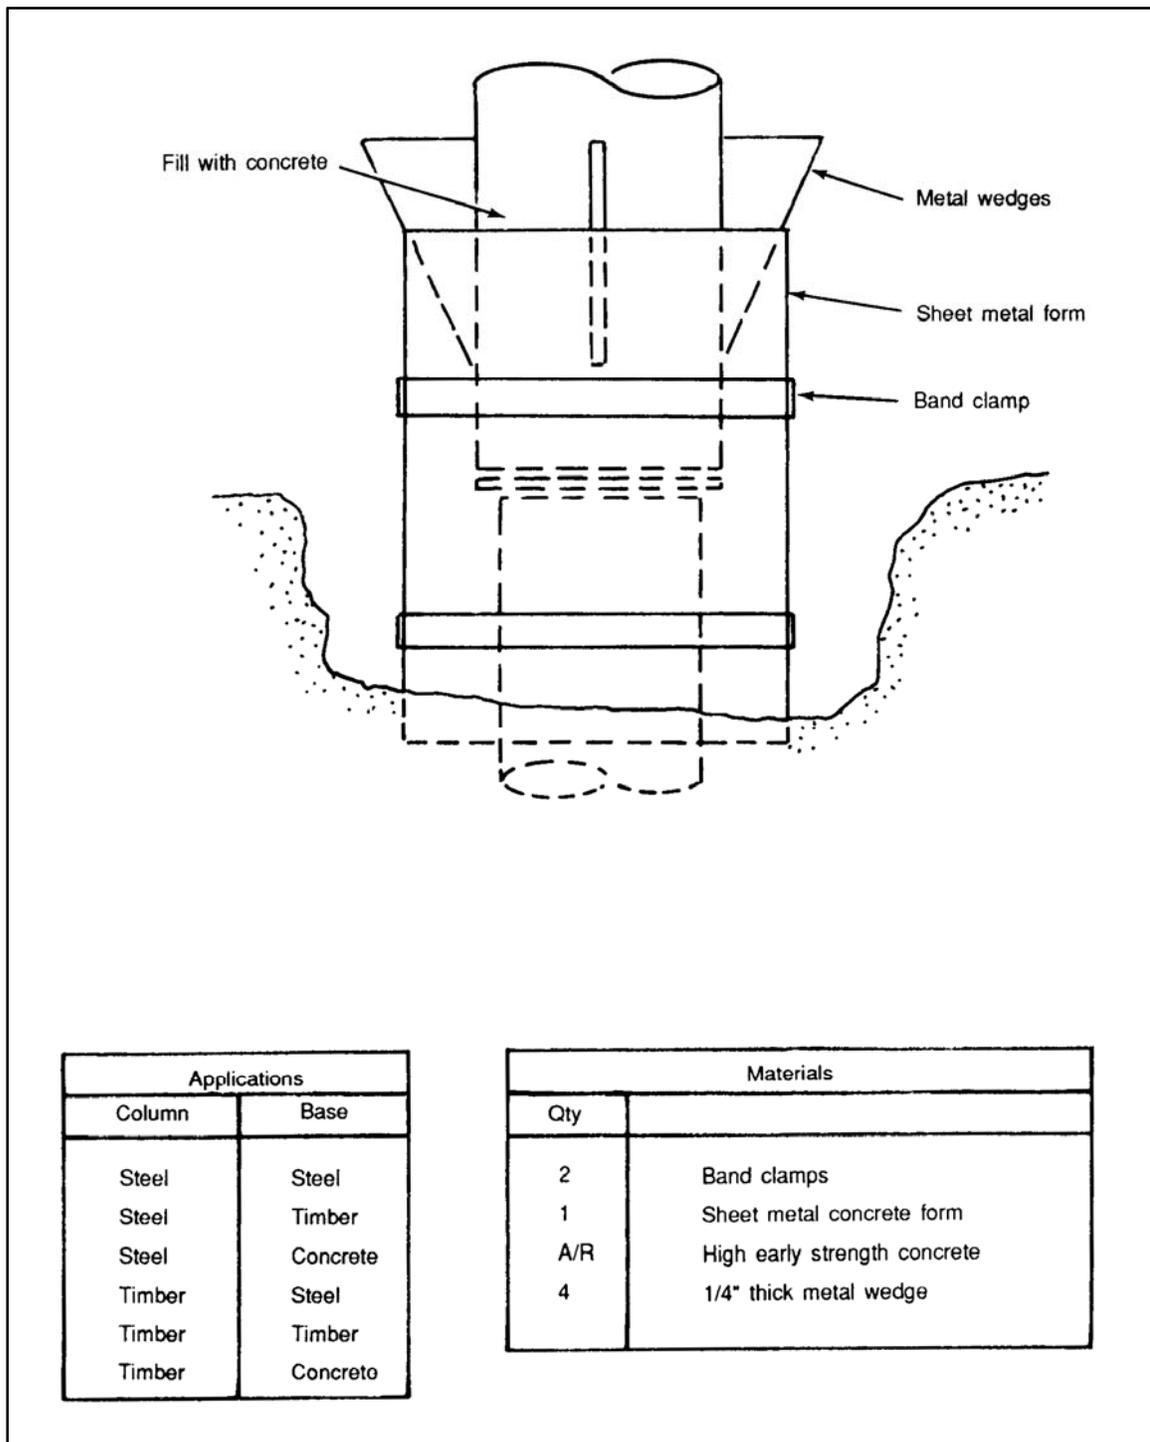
Joining piles at the ocean floor with concrete, column to base connections (connecting method 7)
